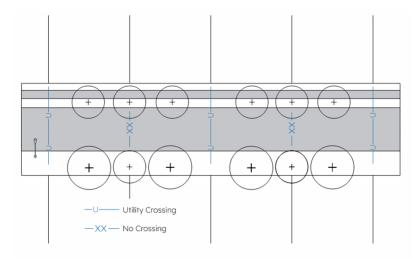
Indicative Planting at Greenfield Subdivision (driveway locations unknown) Note: Additional trees on alternate side boundary lines are subject to utility crossings.
